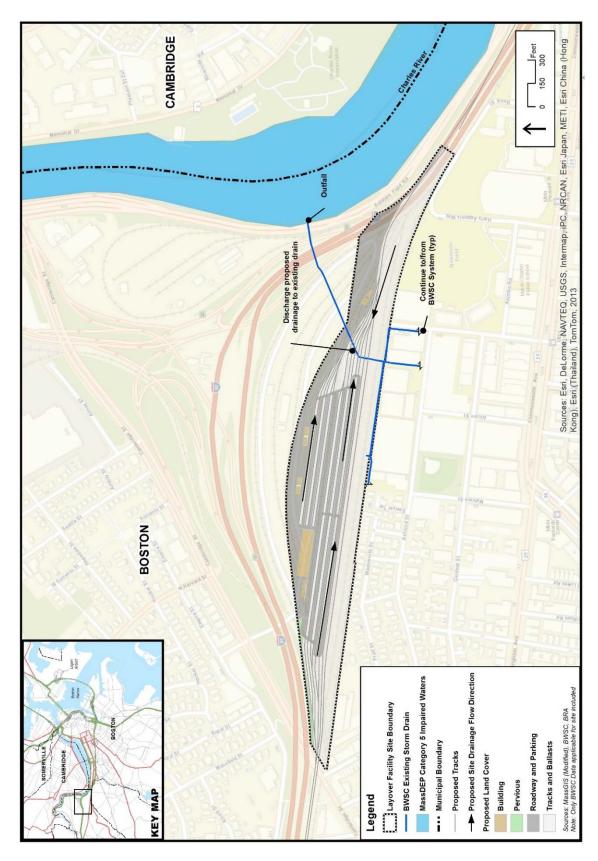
Water Resources Proposed Conditions: Beacon Park Yard Layover Facility Site
